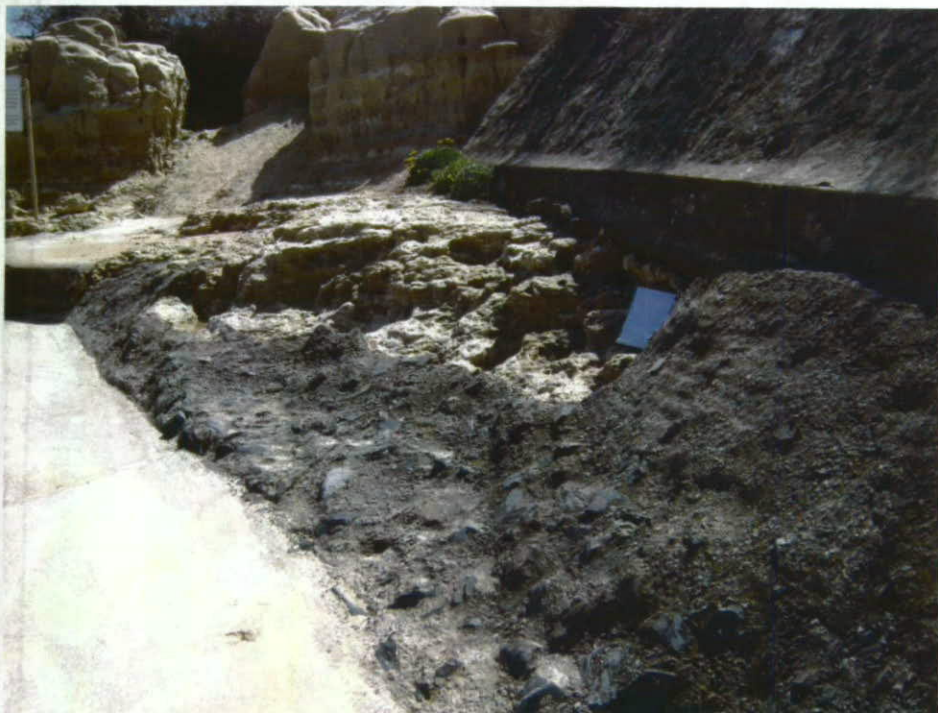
View looking north at the ongoing erosion leading to undercutting of the base of stone retaining wall (built in 1954).
